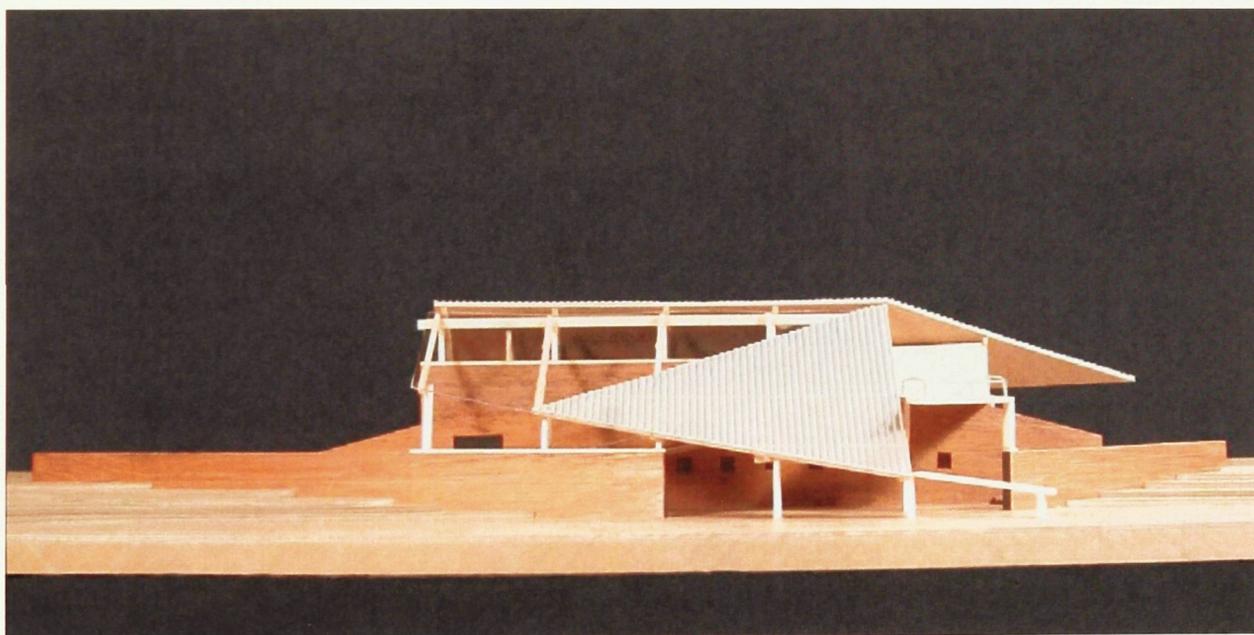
Pavilion: South Elevation*, wood model @ 1:100, 2008. Created by author.
